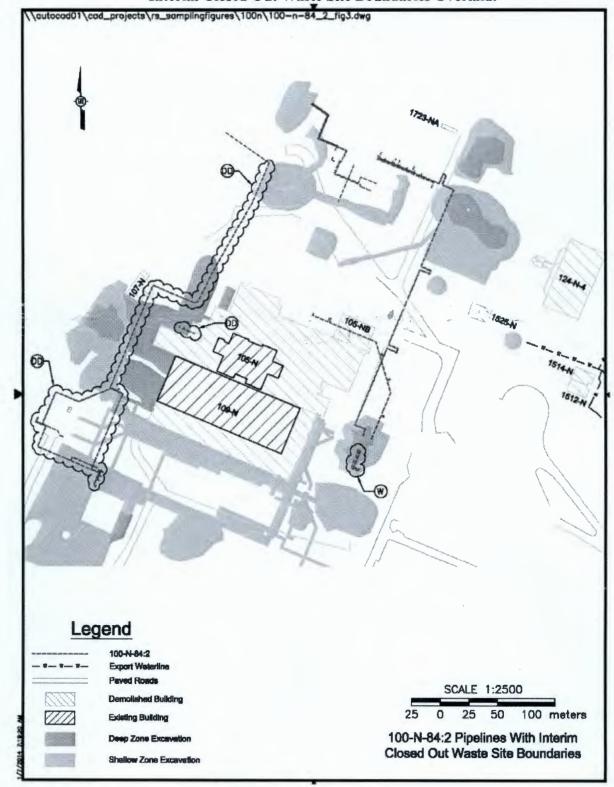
100-N-84:2 Subsite Segments with Interim Closed Out Waste Site Boundaries Overlaid.
